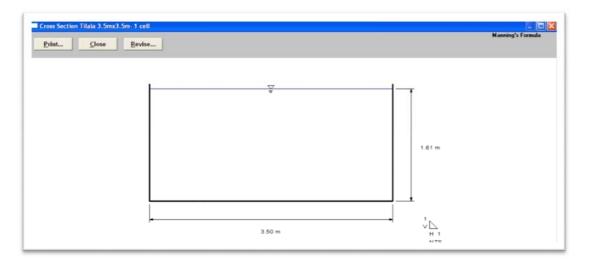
Hydraulic Section of Flow in 1-cell Box Culvert at Wadi Tilala
